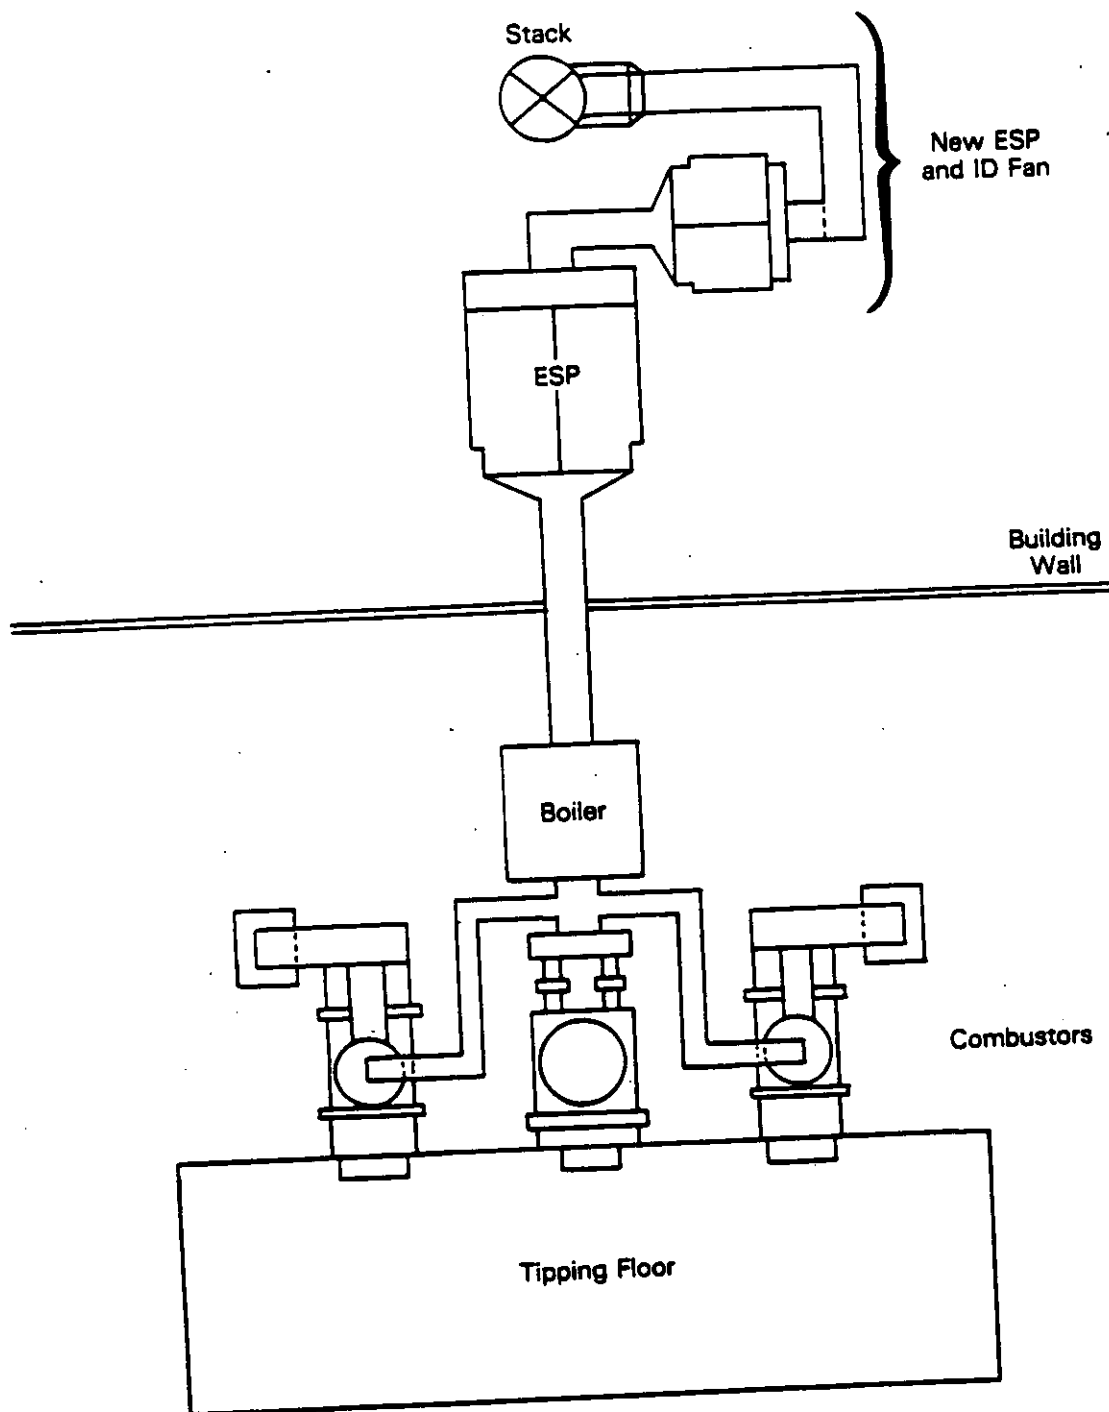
Plot Plan of Particulate Control Equipment
